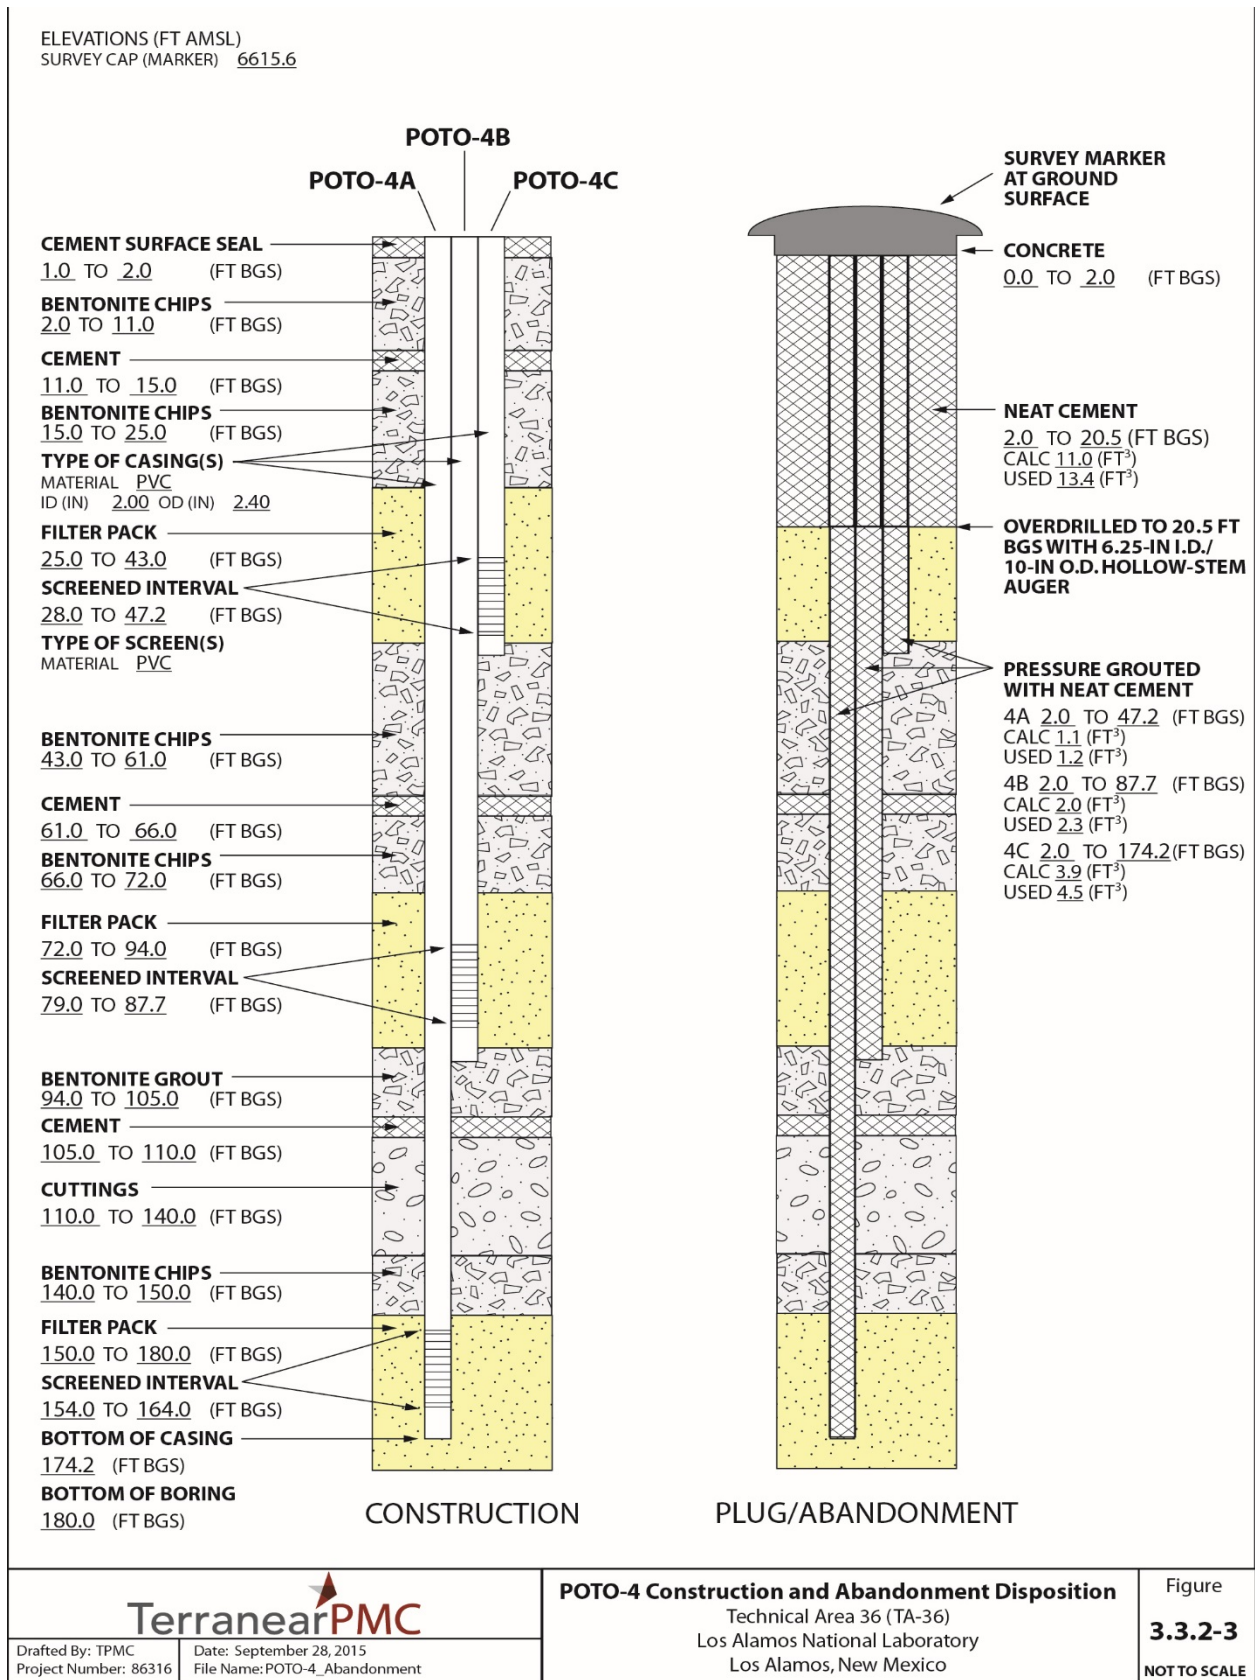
POTO-4A, B, C construction and abandonment disposition
